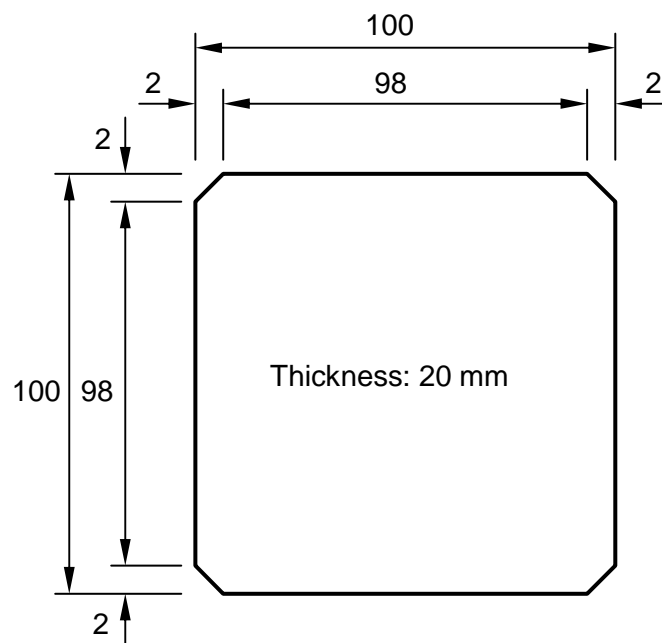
Dimensions of the biaxial SHCC specimen in millimetres
